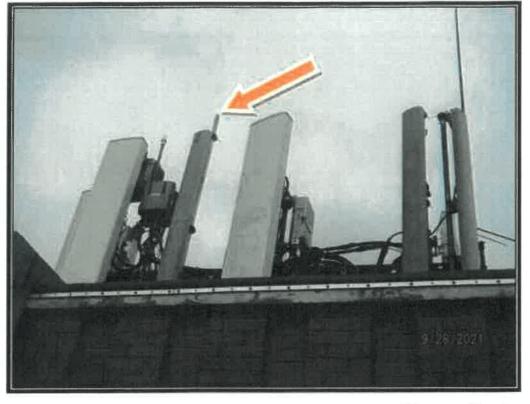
Proposed Location of A3 mmWAVE Integrated Antenna/Radio on New Mast Pipe
